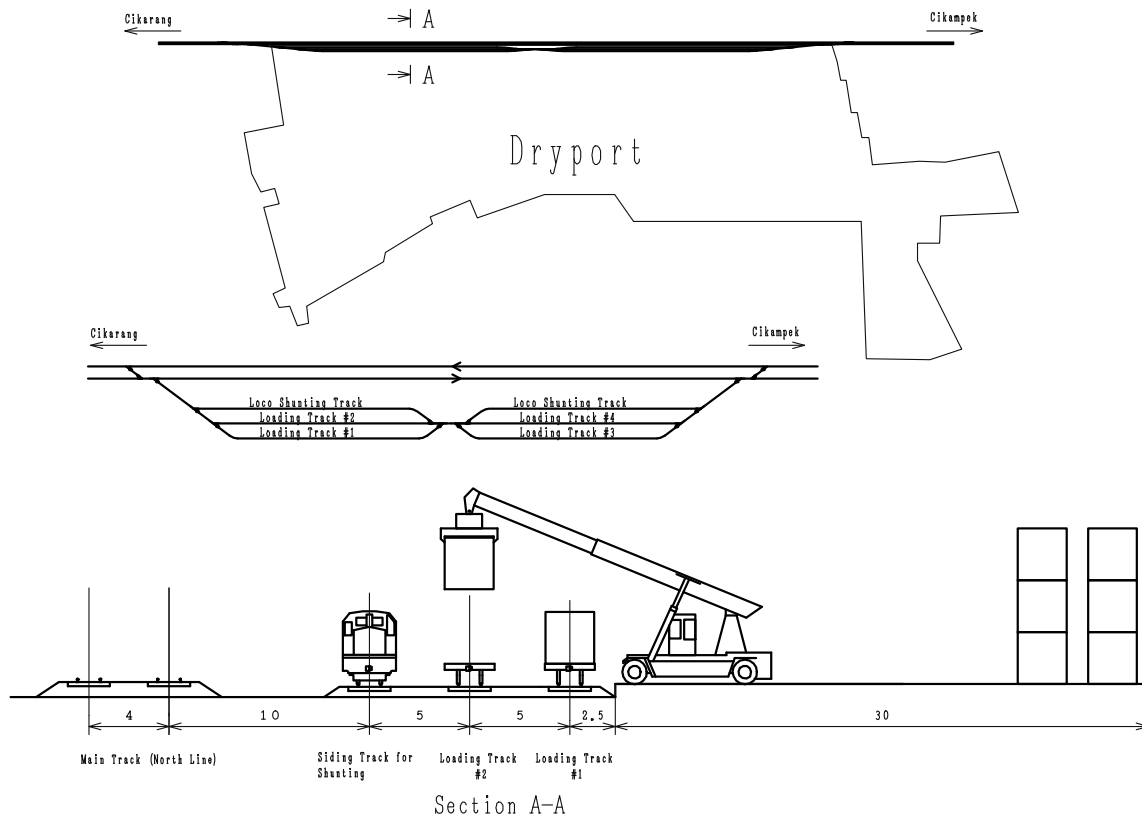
Proposed Track Layout of Cikarang Dryport
